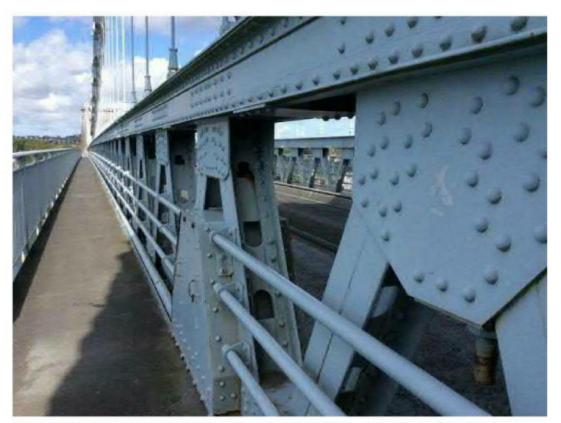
Finishes: deck elements - monitor the small areas of chipped paint and rust staining throughout the west truss
